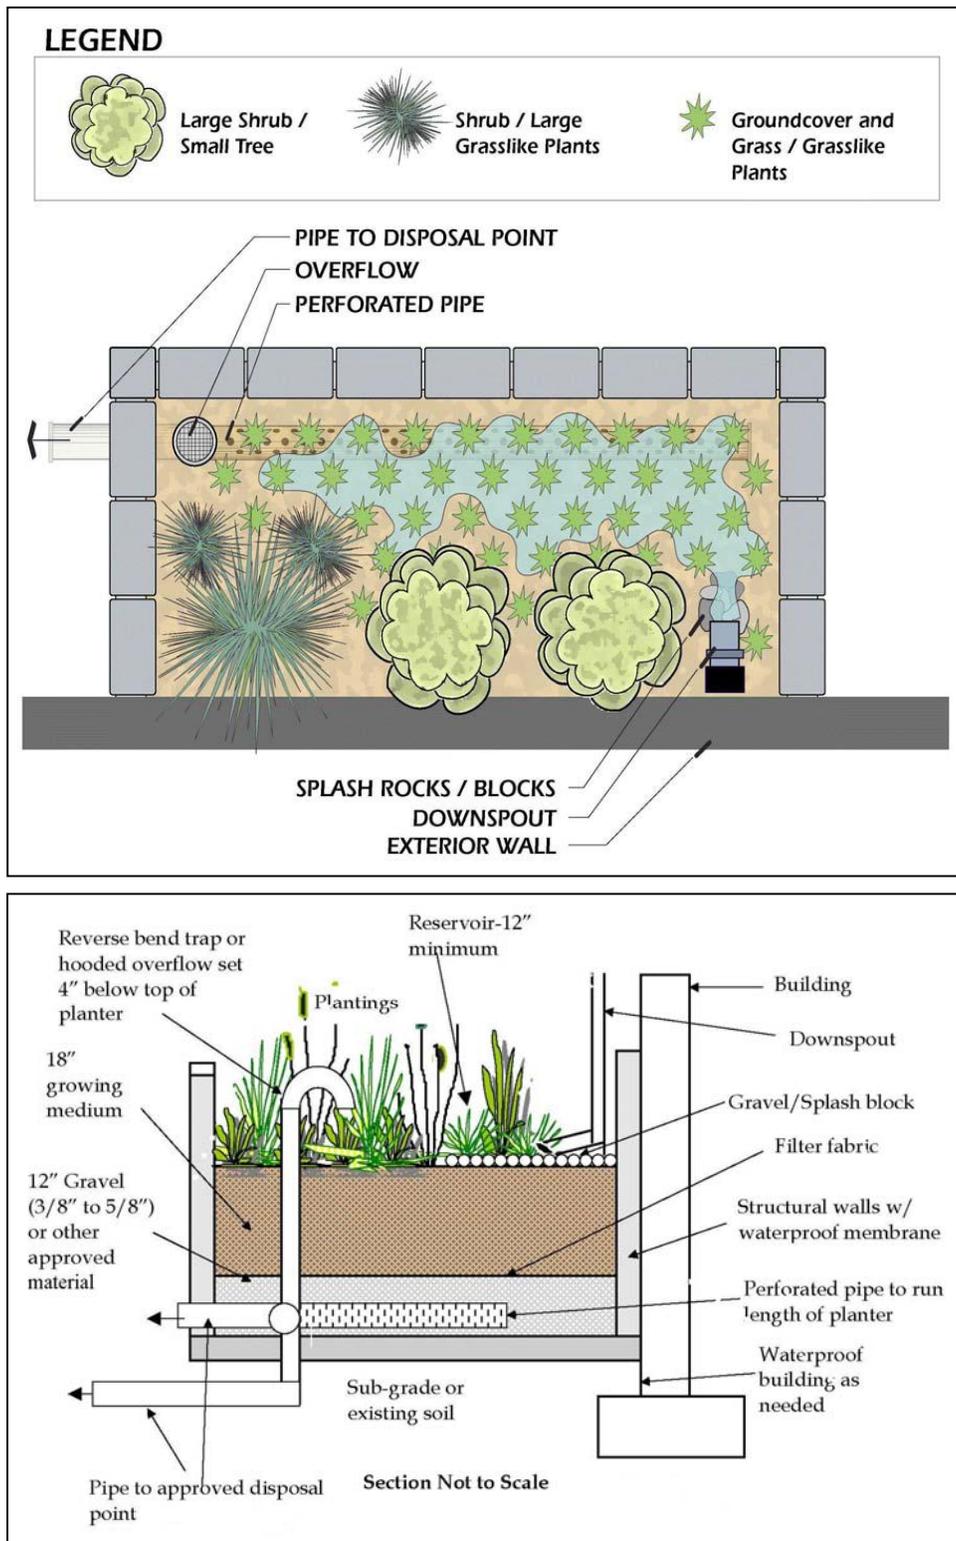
Plan view (top) and cross section view (bottom) of a flow-through stormwater planter (Source: Portland, OR, 2004).
